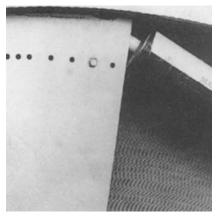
After adjusting the purge and tightening the adjusting and bottom pivot bolts, apply silicone caulk where the purge wiper joins the purge front plate.
